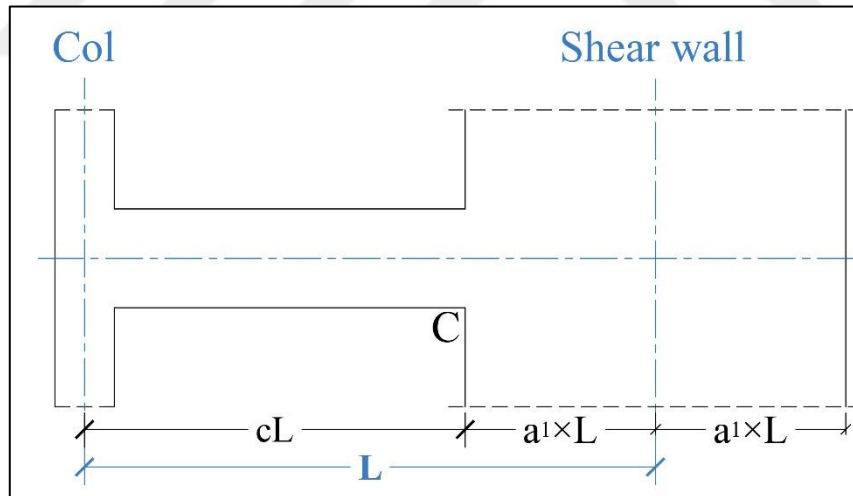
Coupled Beam Connected Between Shear Wall and Column.
